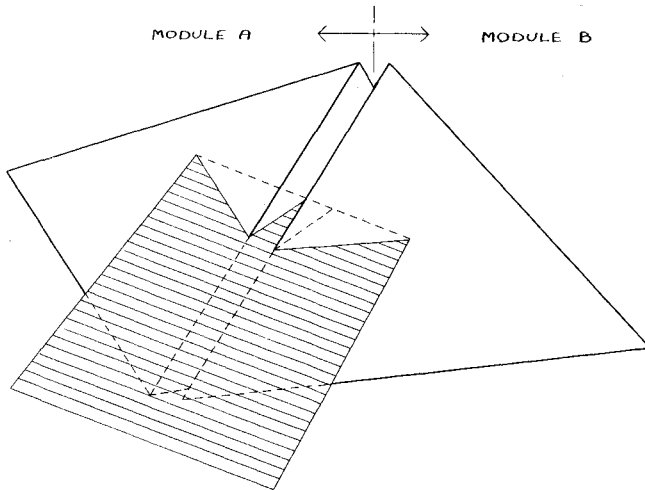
Two modules face to face, indicating the cutting plane for the section view of Fig. 3b.
